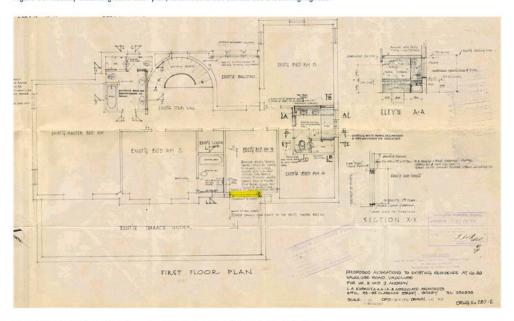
Kubany scheme first floor plan, with works not carried out shown highlighted.
